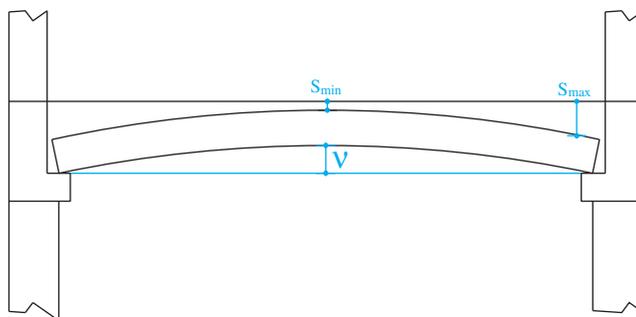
The minimum height between floors must be measured at the supports of the hollow core floor.
